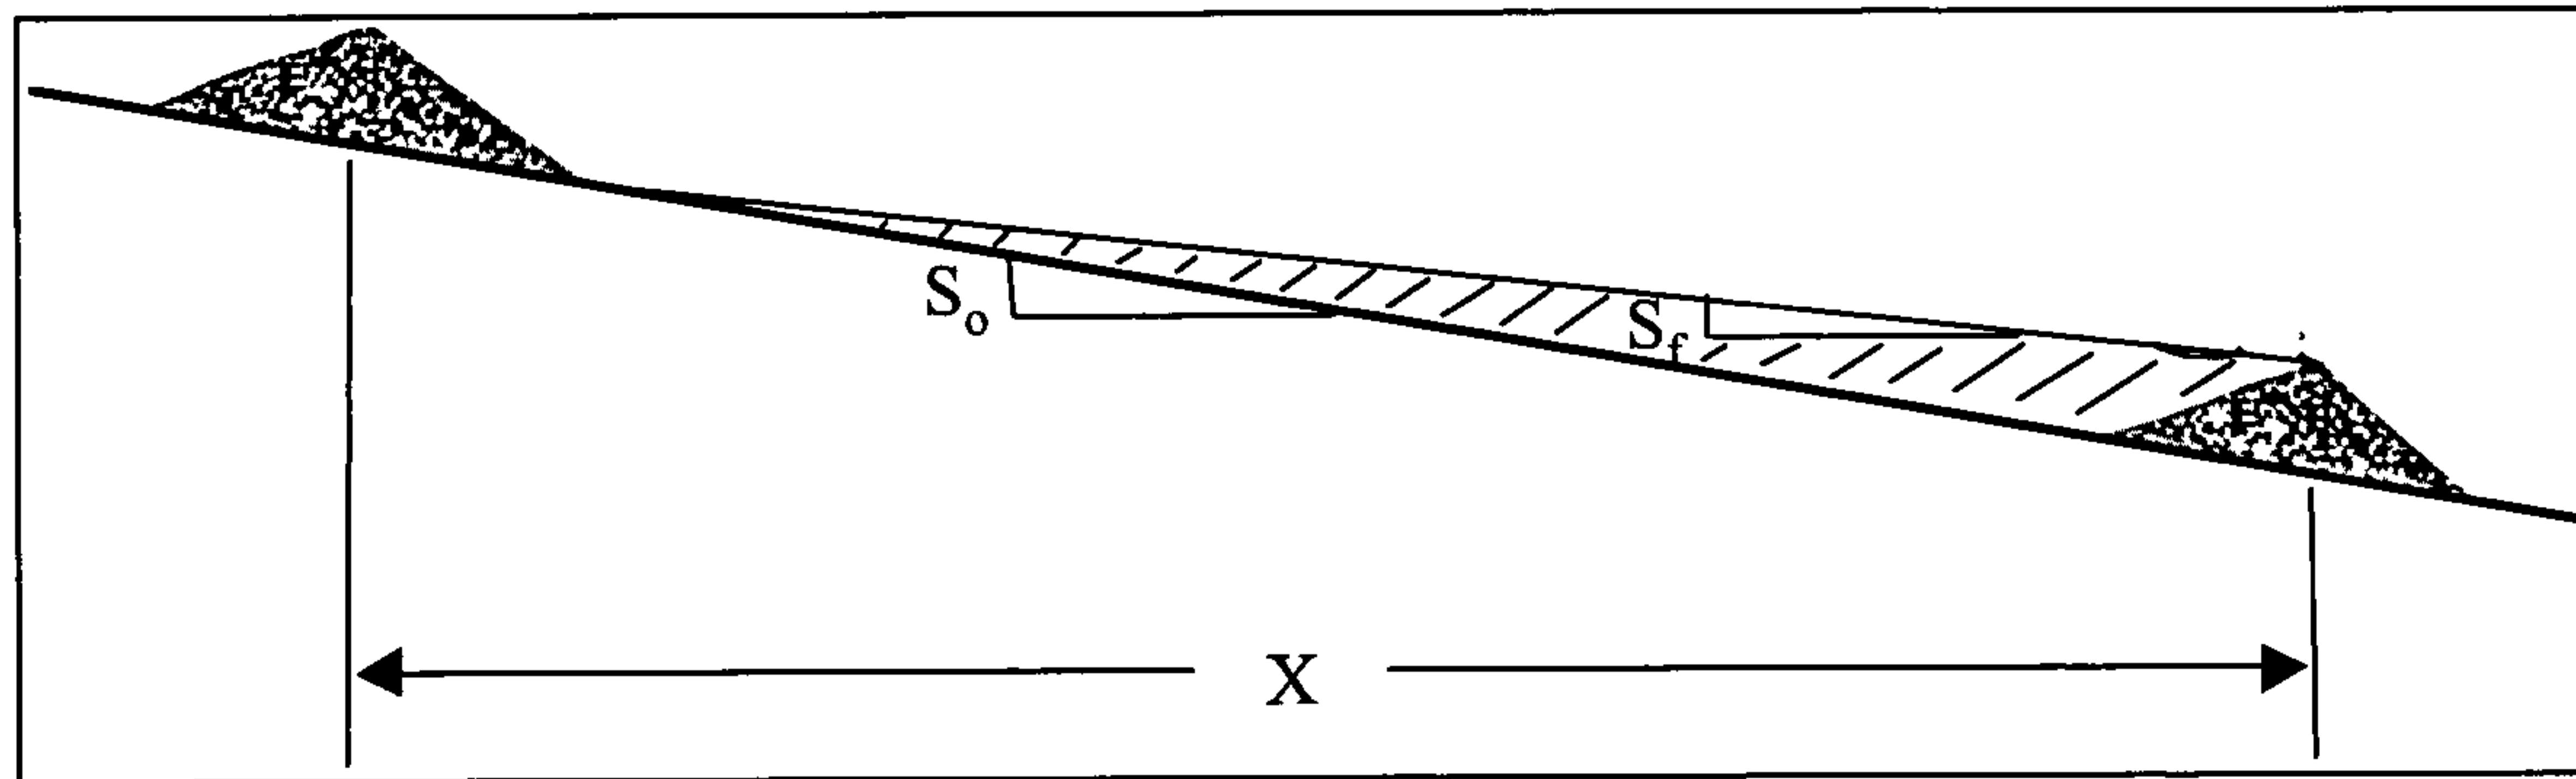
Spacing of grade control structure (adapted from Mussetter 1982)
